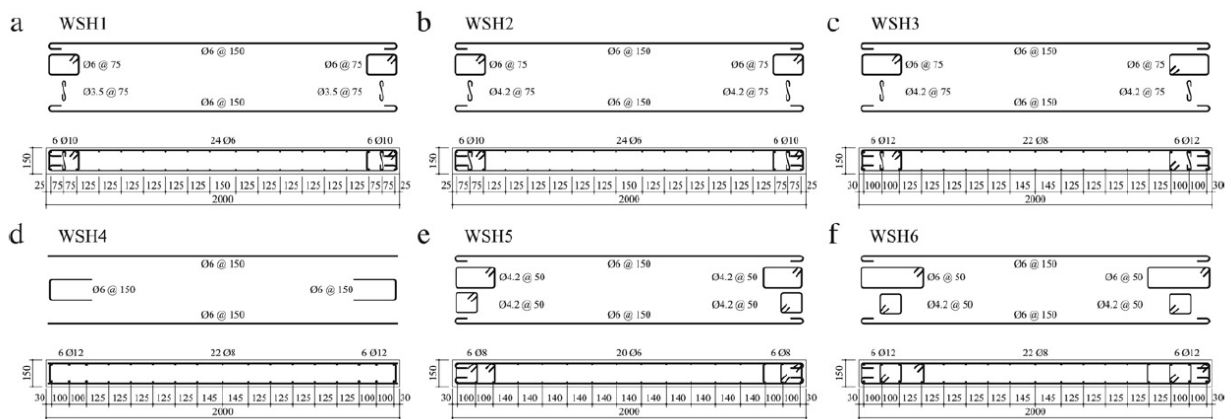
Dazio et al. (2009) specimen cross-section dimensions and reinforcement details
